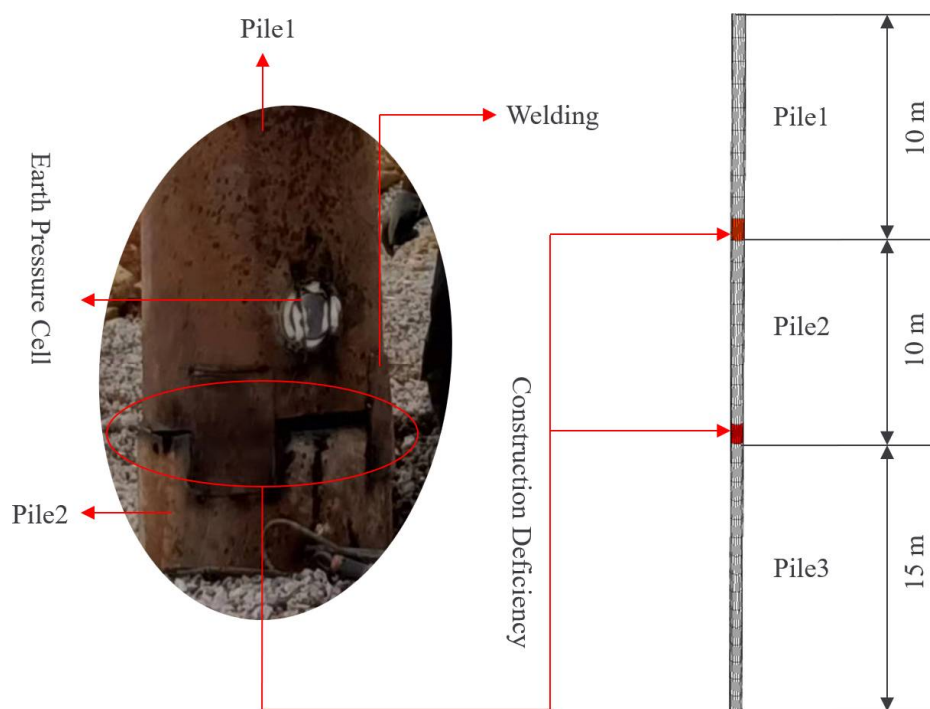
The schematic diagram of the welding joints of the steel pipe pile.
